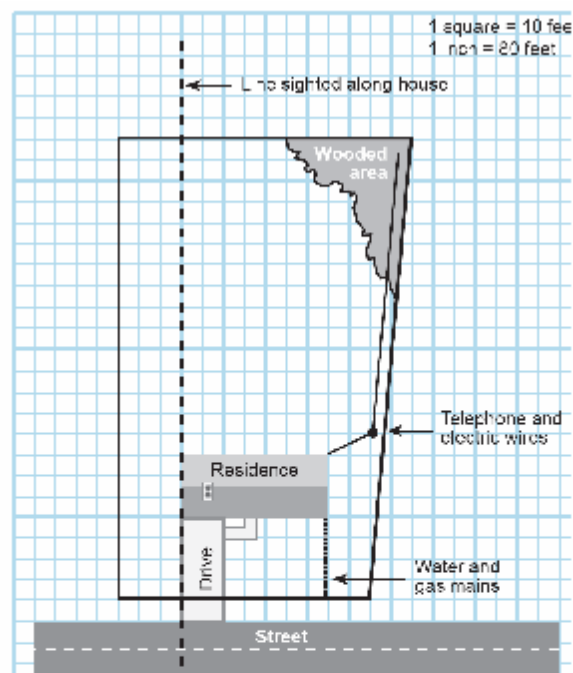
On the base plan, draw the lot, house and existing landscape features that will be retained.
